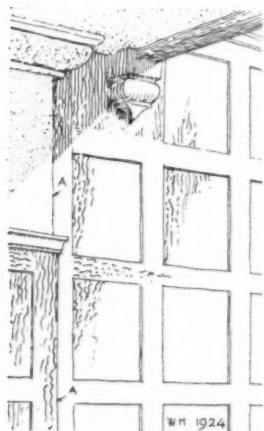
Mouldings RETURN ABOUT A BREAK IN THE PLAN.
